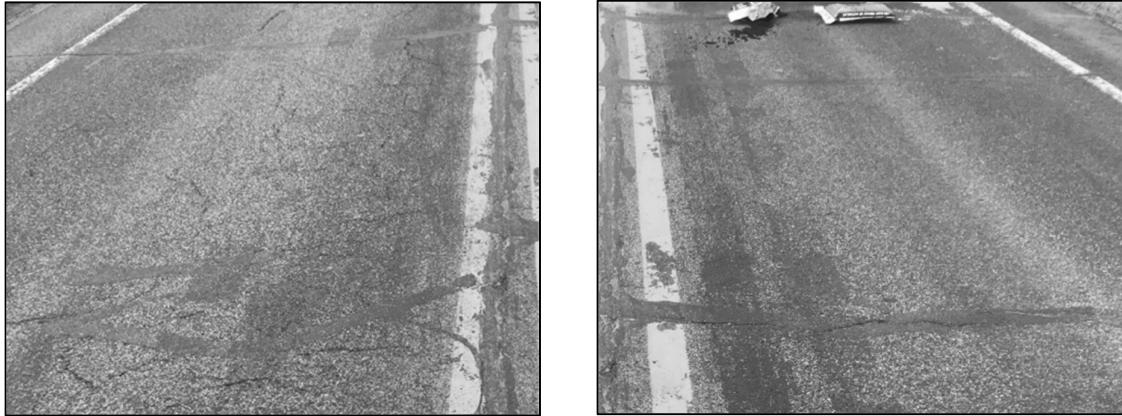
Observation of Cracking of Superpave 4 (left) and Superpave 5 (right) Asphalt
